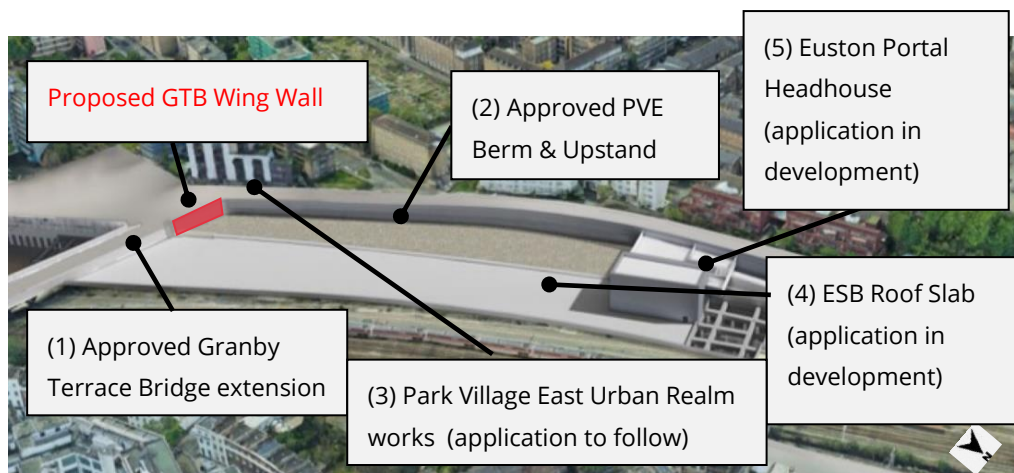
Indicative visualisation of the proposed extension to Granby Terrace Bridge
